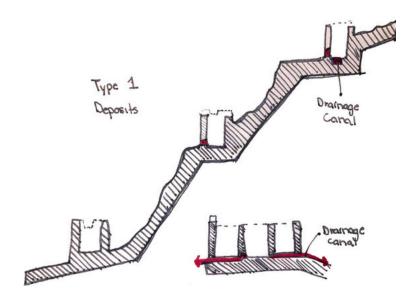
Retention wall 'Z' section by Jean P. Protzen
